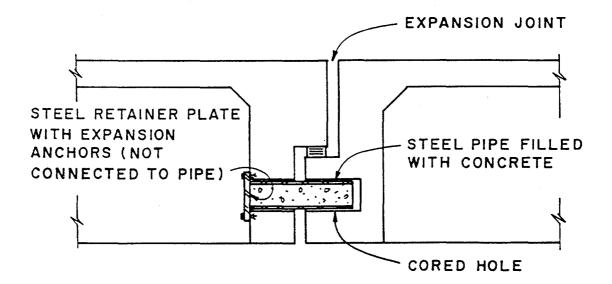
Transverse restrainer retrofit for a concrete bridge.
